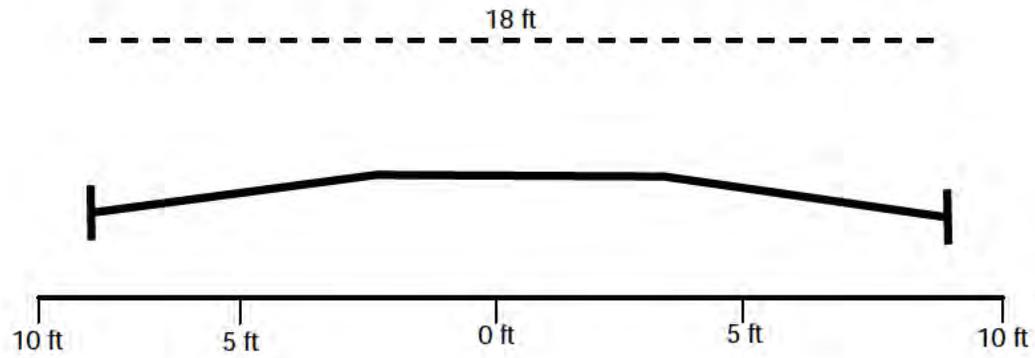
Typical Cross Section of Earthen Plug (Large Drainage Ditches/Canals)
